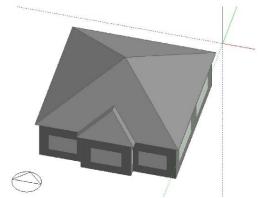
Modeled residential building plan in the cities of London, Birmingham and Manchester.
